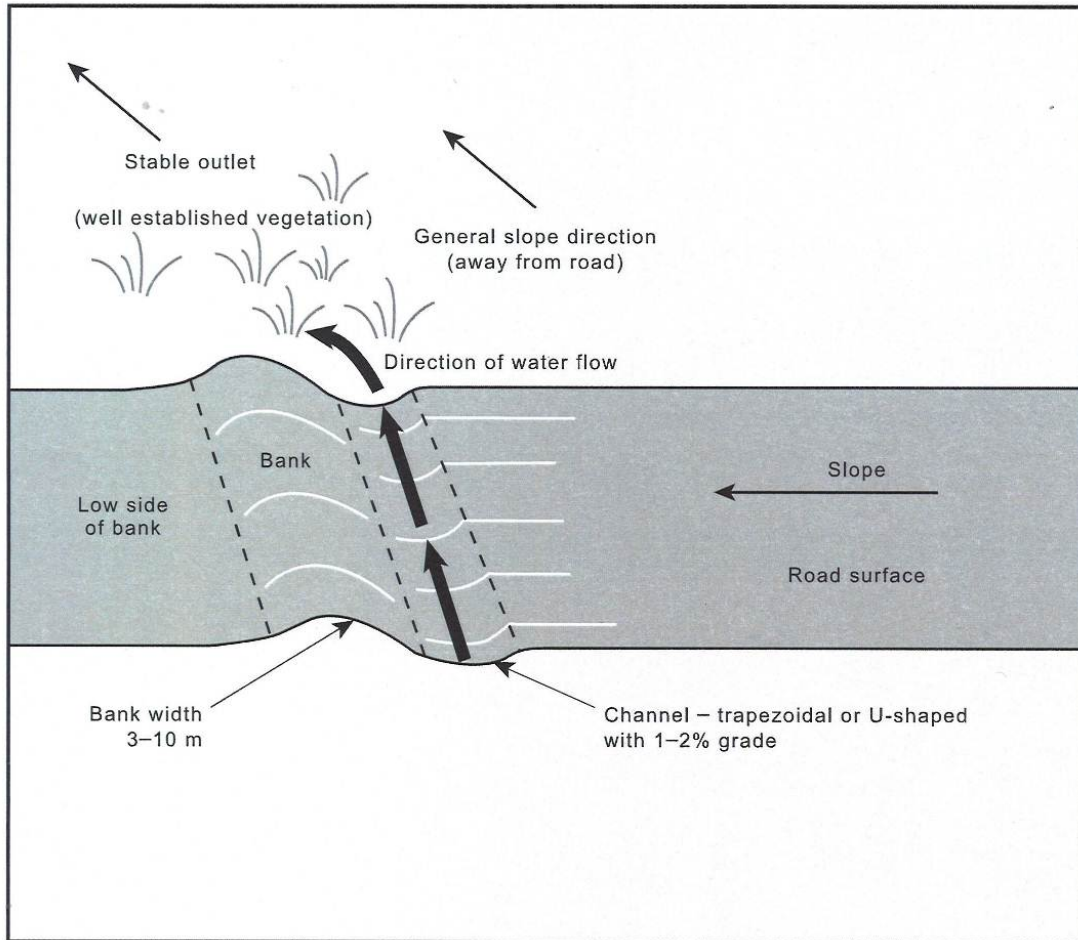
Typical cross bank layout and construction (Source: Managing Urban Stormwater; Soils and Construction – Volume 2C Unsealed Roads)
